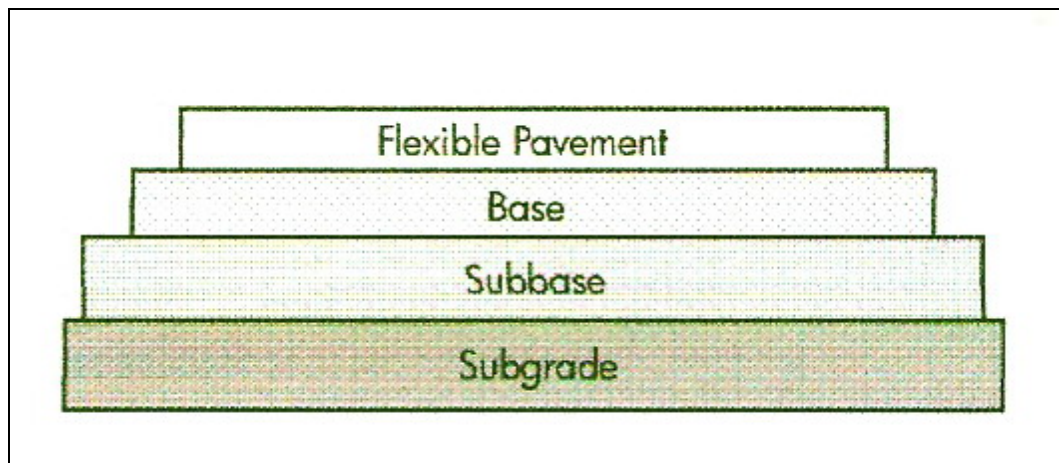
Schematic of a flexible pavement structure (FHWA 2004)
